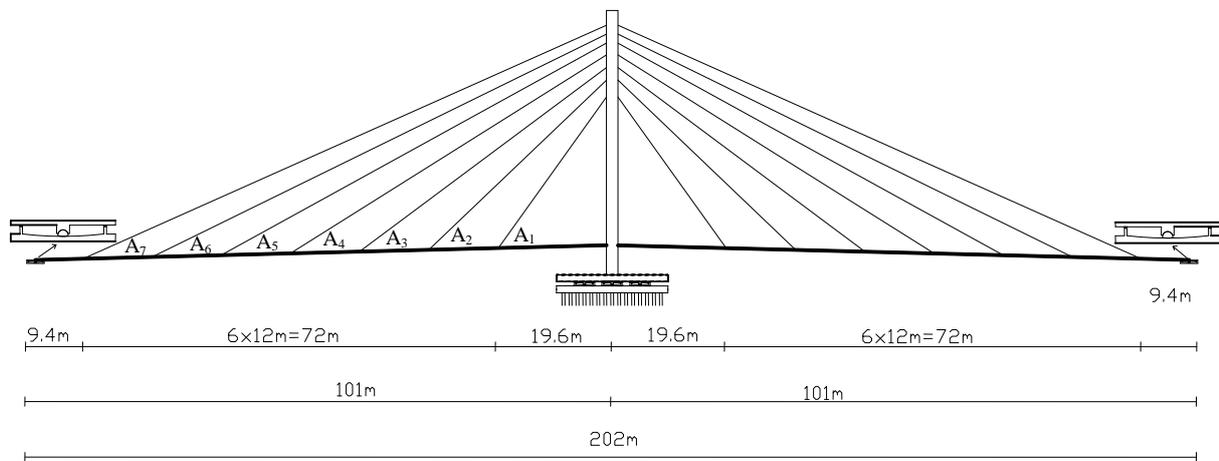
The schematic form of Manavgat Cable-Stayed Bridge
